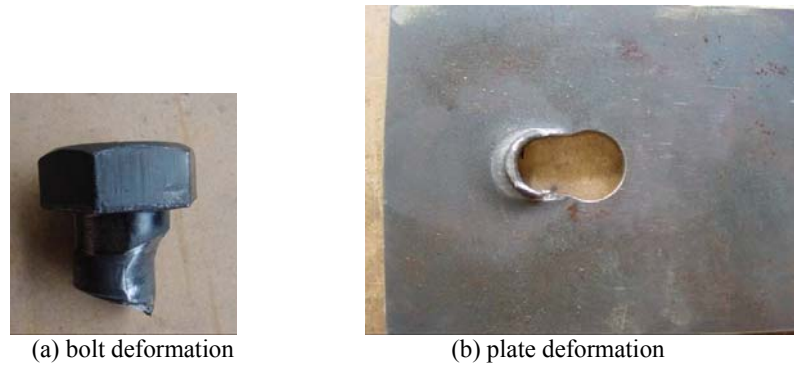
Bearing deformations on B3025_1 test specimen.
